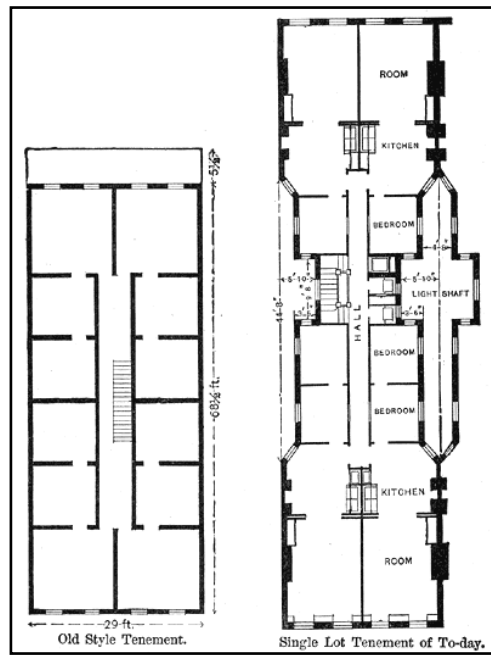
An Old Style Tenement Housing and Tenement Housing Building after the Law
